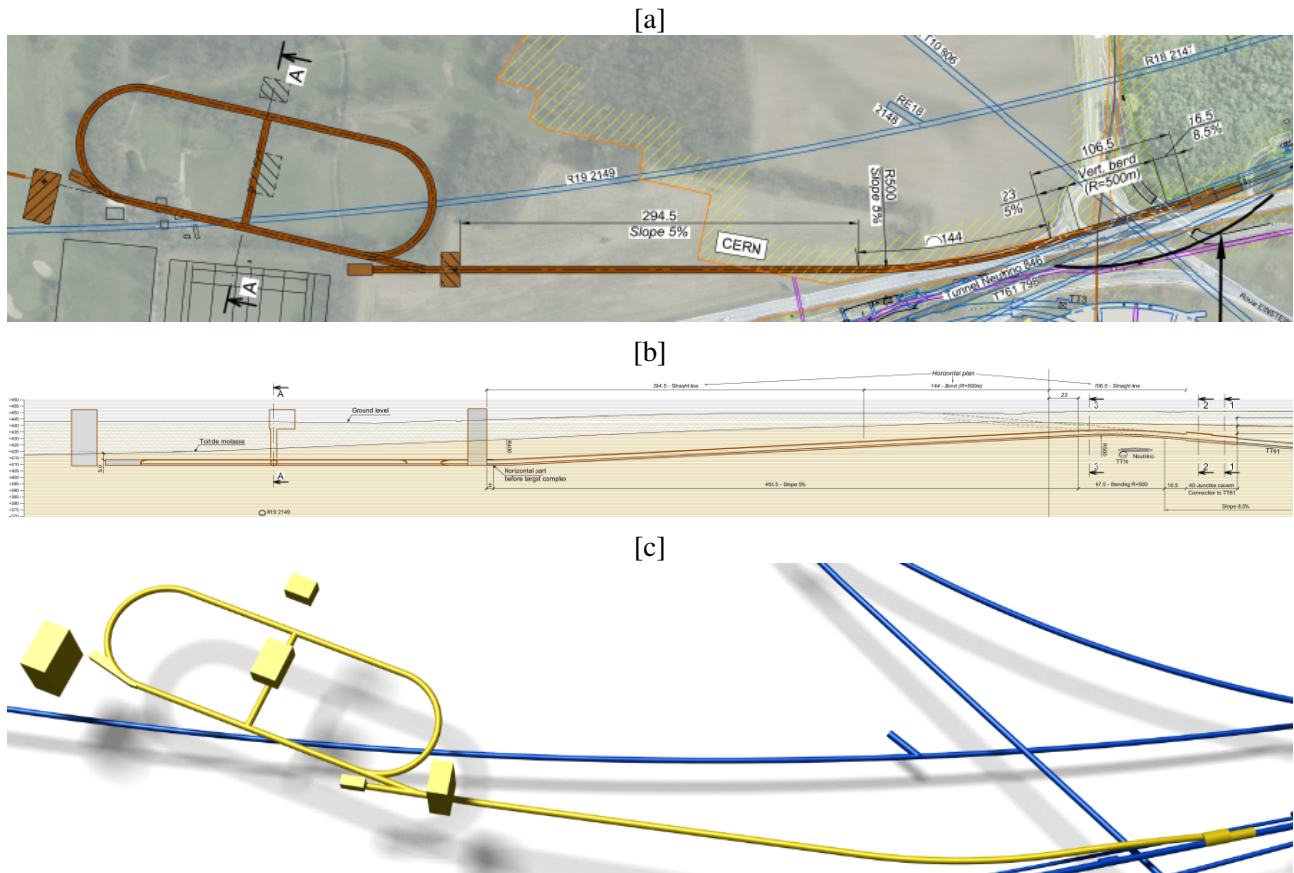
Plan view showing general arrangement (a), long section of extraction tunnel (b) and 3D view of proposed facilities in yellow (c), all between the extraction point and Muon decay ring.
